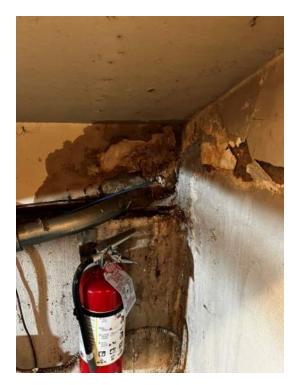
IMG_1242 – Visible water infiltration and moisture damage at inside corner of foundation wall and incoming conduit penetration. Plaster finish on foundation wall exhibits large chips and cracks from moisture.
